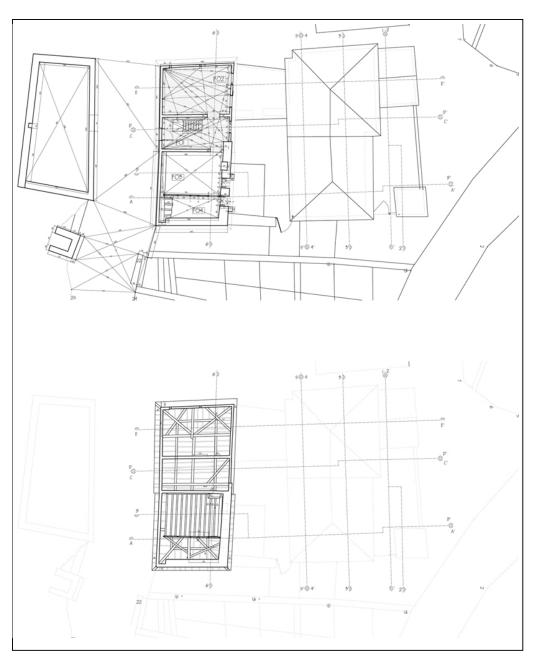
Plan and ceiling plan of Çarboğa House at +7.00
